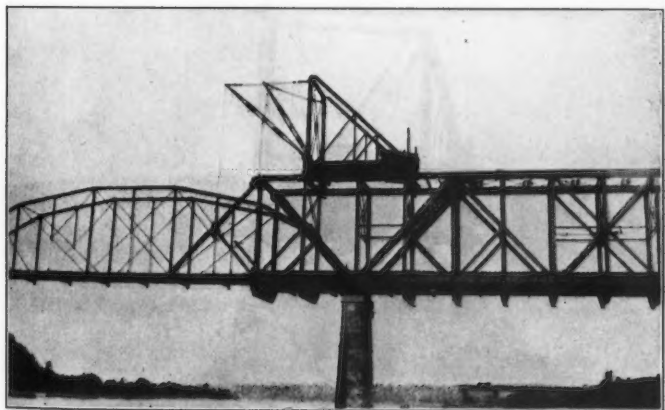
PLACING DIAGONAL OF SPAN 2.
